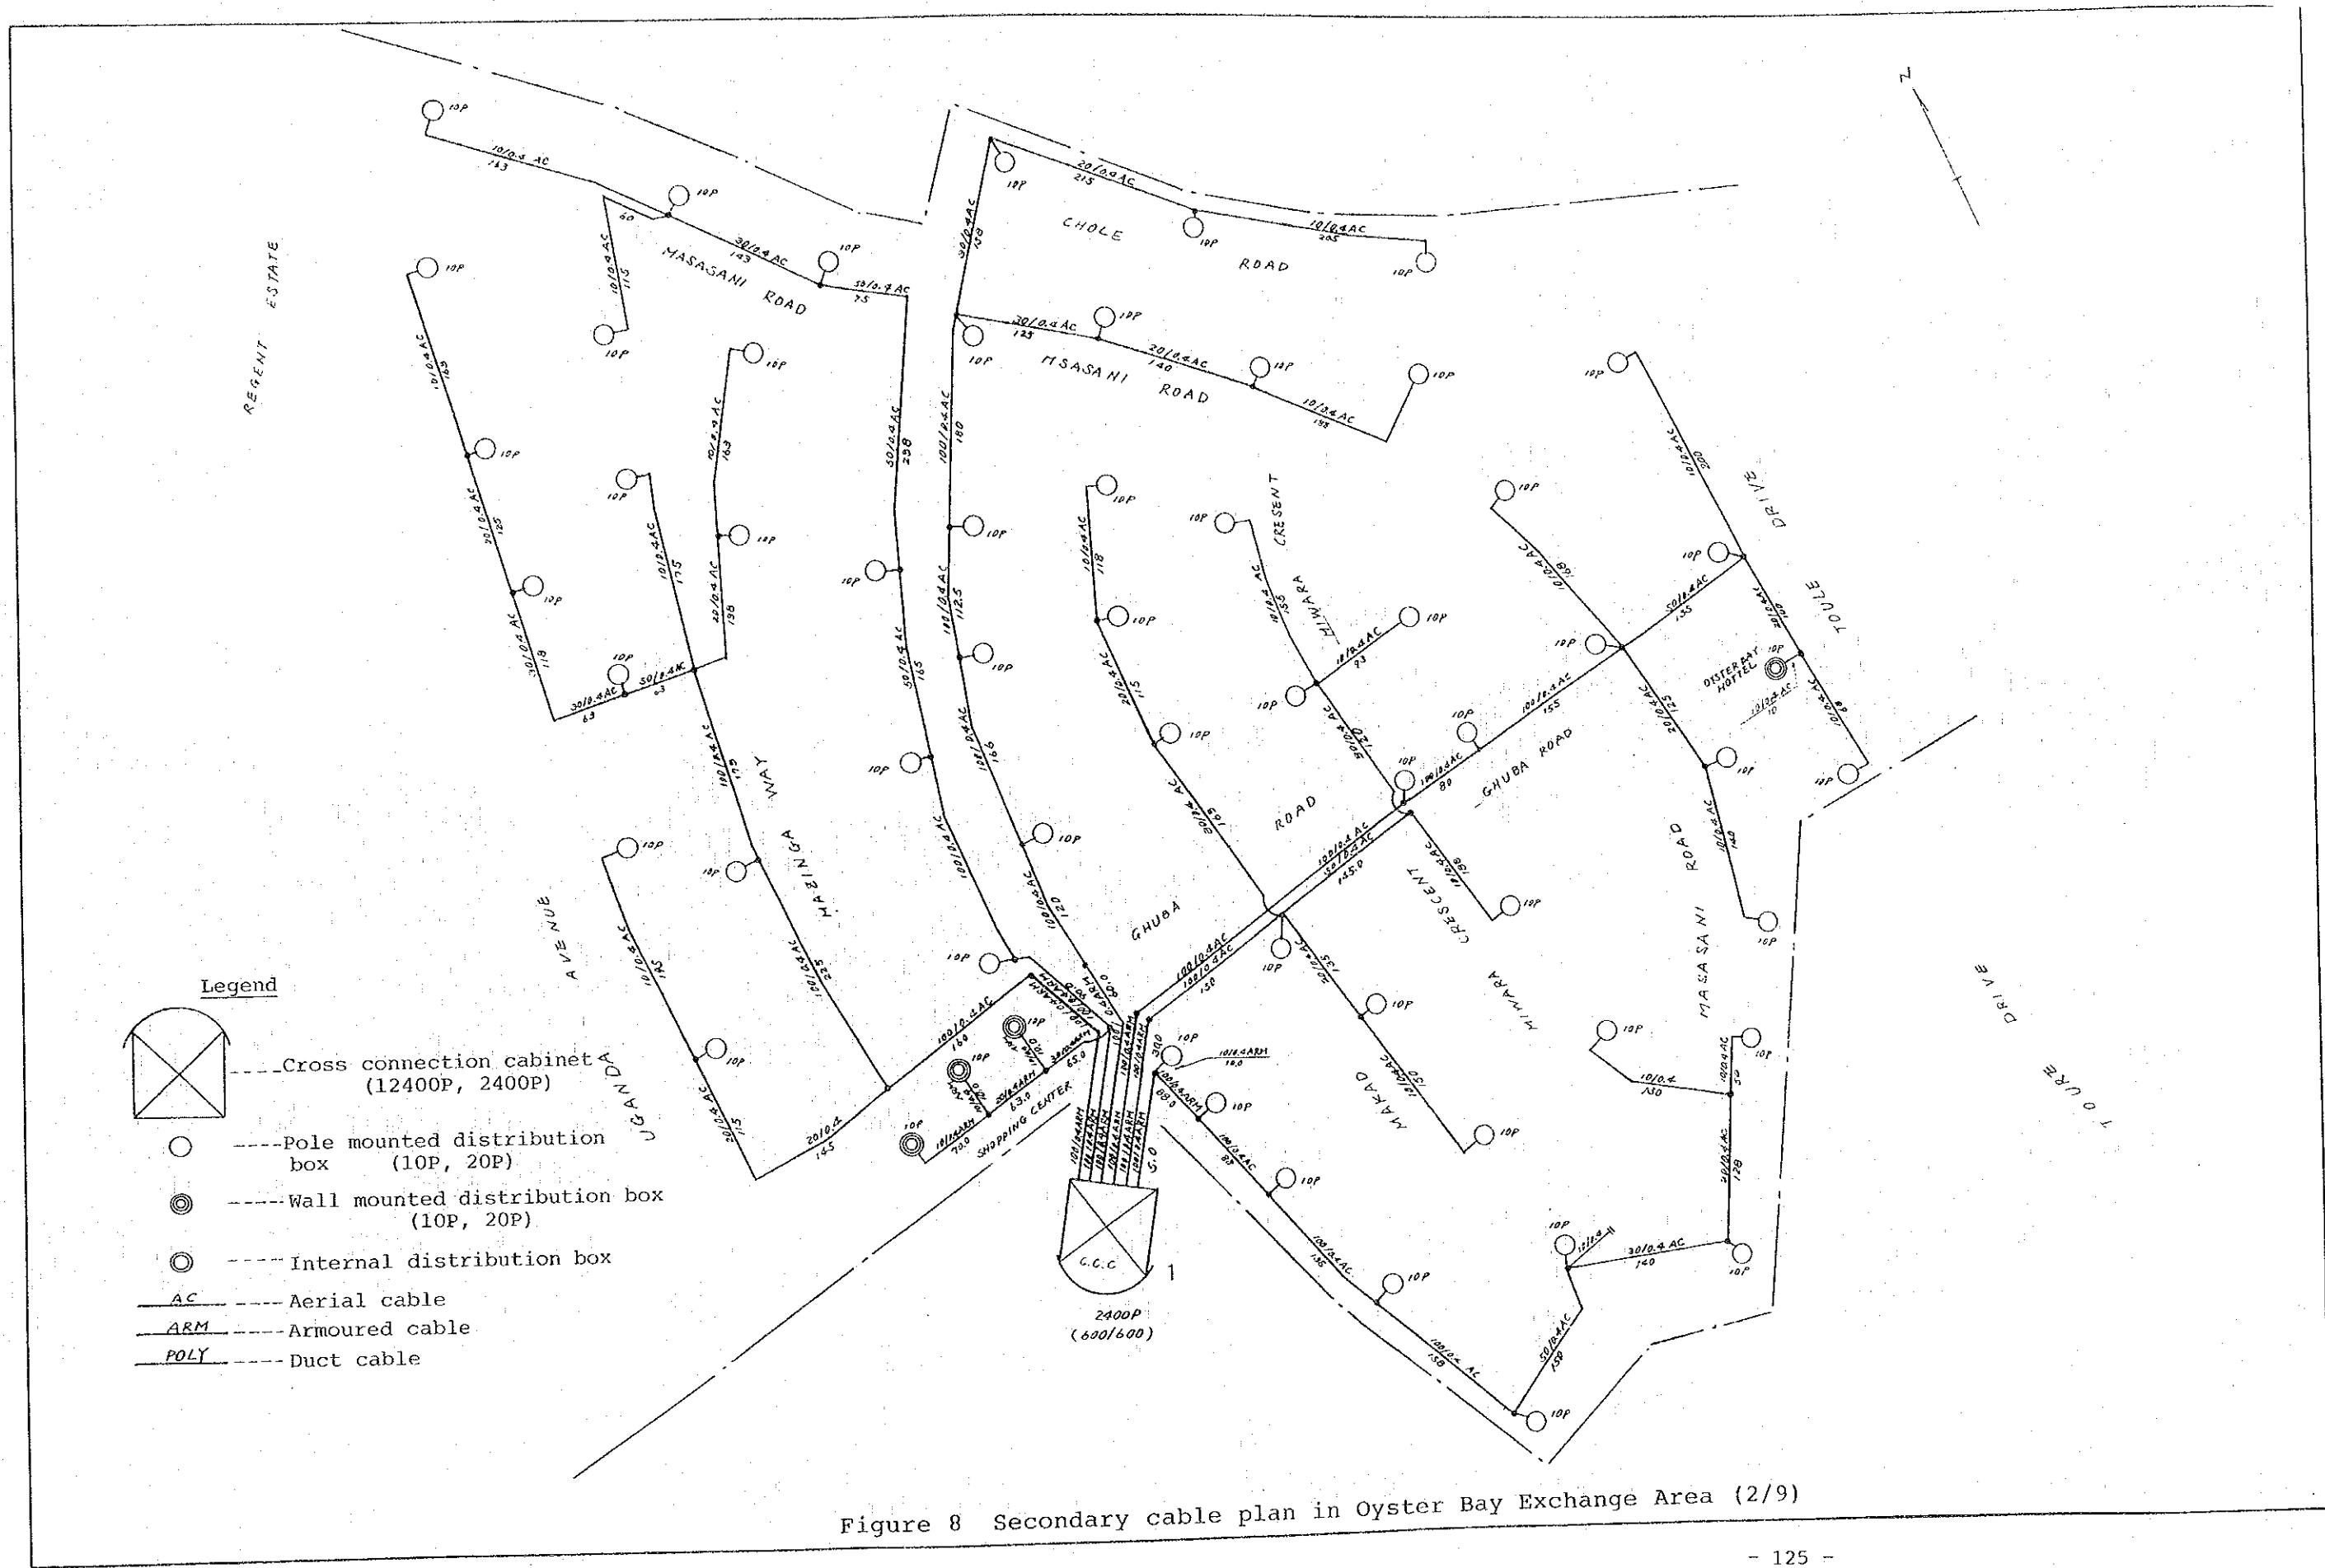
Secondary cable plan in Oyster Bay Exchange Area (2/9)
